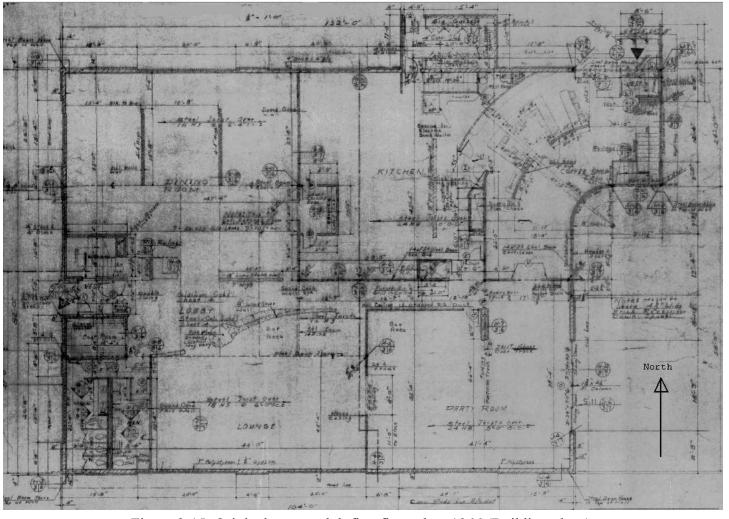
Original supper club first floor plan, 1966 (Building plans)
